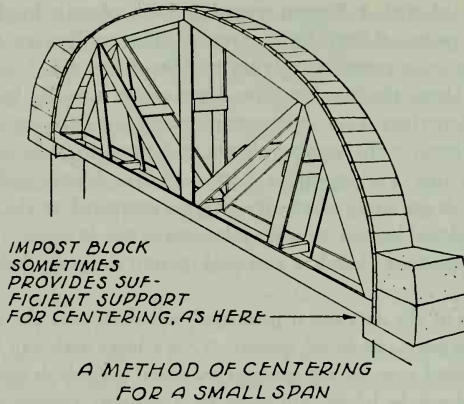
An arch under construction, illustrating the use of wooden centering.
